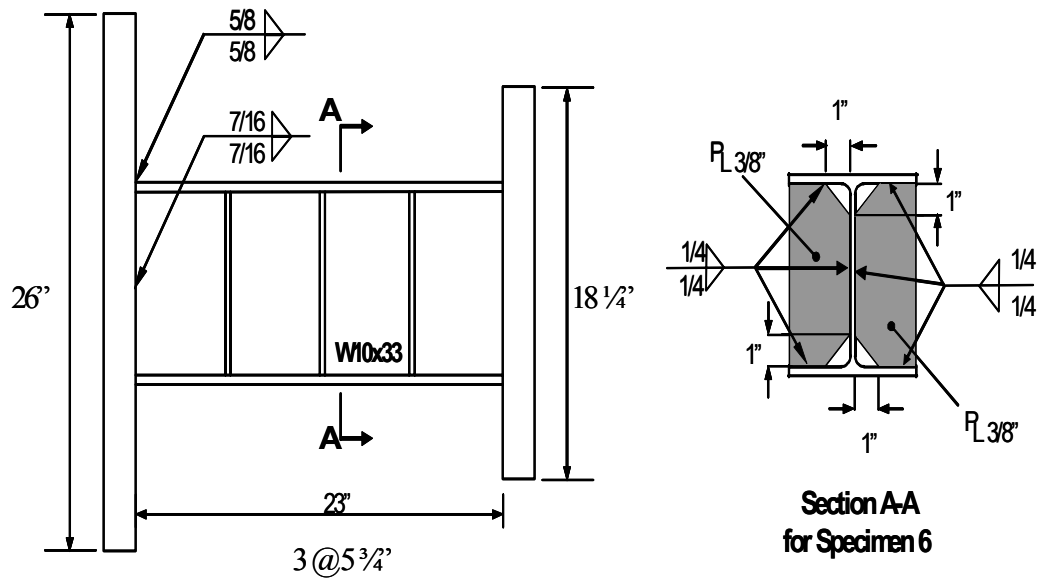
Welding and stiffener details for Specimen 6
